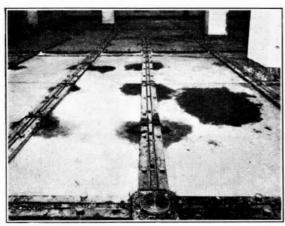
LAYOUT OF UNDERFLOOR STEEL DUCTS ON STRUCTURAL CONCRETE.
